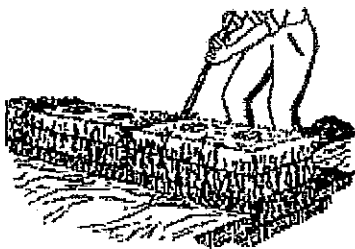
Constructing a straw bale barrier to slow runoff and prevent erosion.
